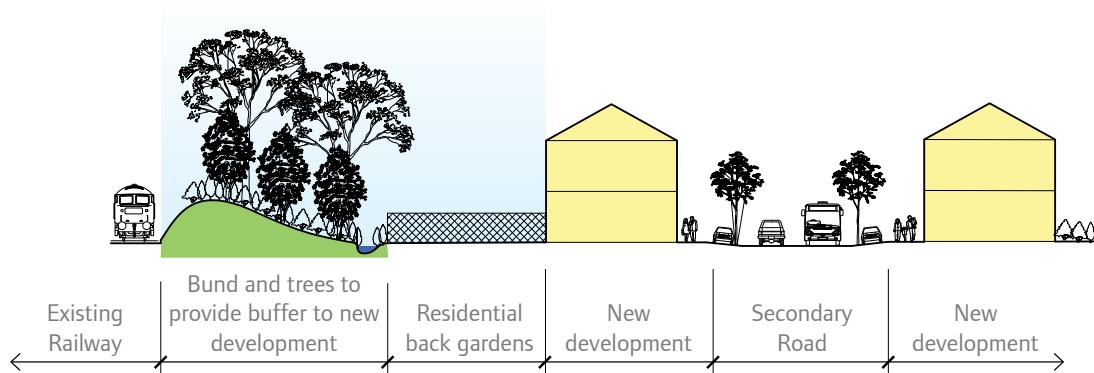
Sketch illustrating treatment of the edge between railway and housing - A bund and private back gardens provide a green buffer along the railway tracks while residential front doors provide active frontage and surveillance onto the street
